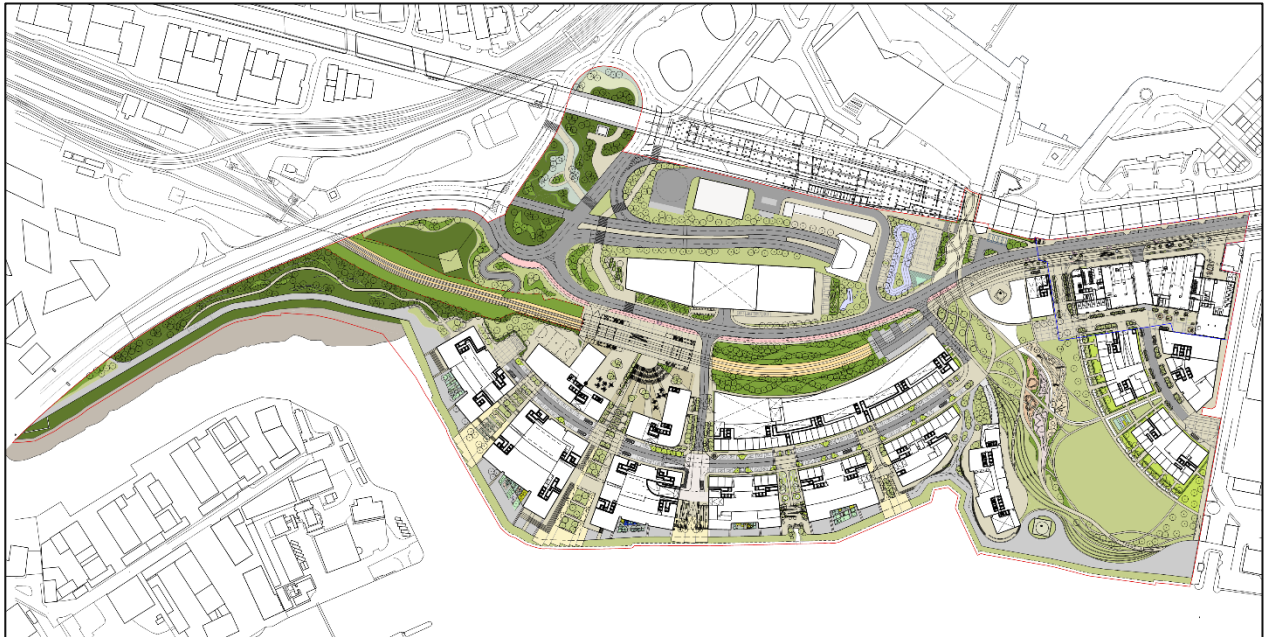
Plan drawing showing the proposed development (Source: Patel Taylor, drawing 522-PT-MP-TYP-DR-L-PL-1001 Rev P19)
